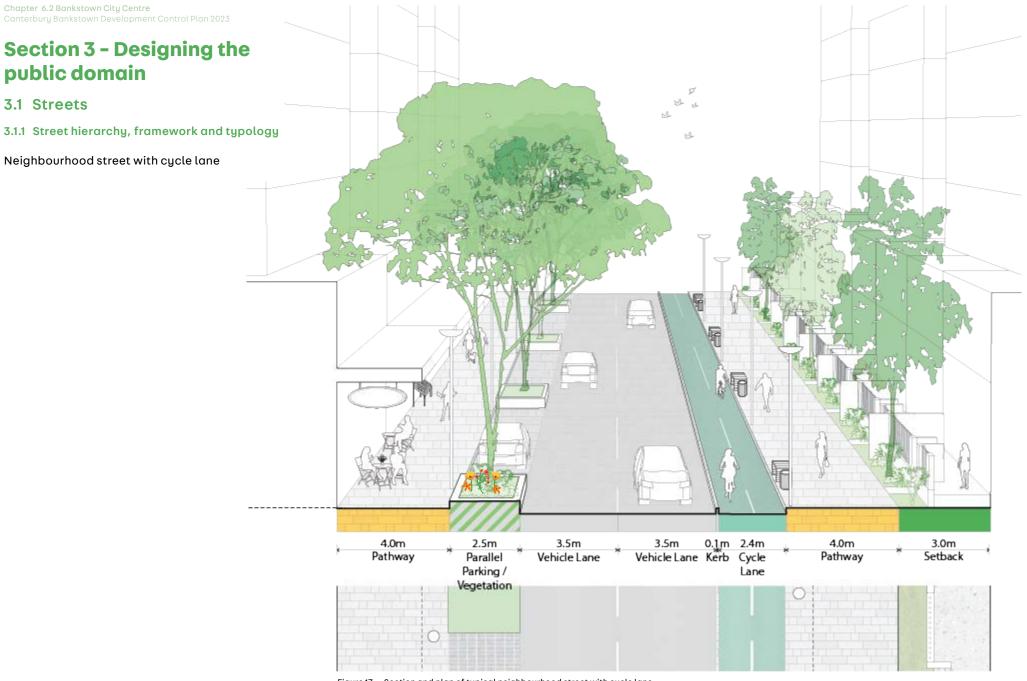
Section and plan of typical neighbourhood street with cycle lane
